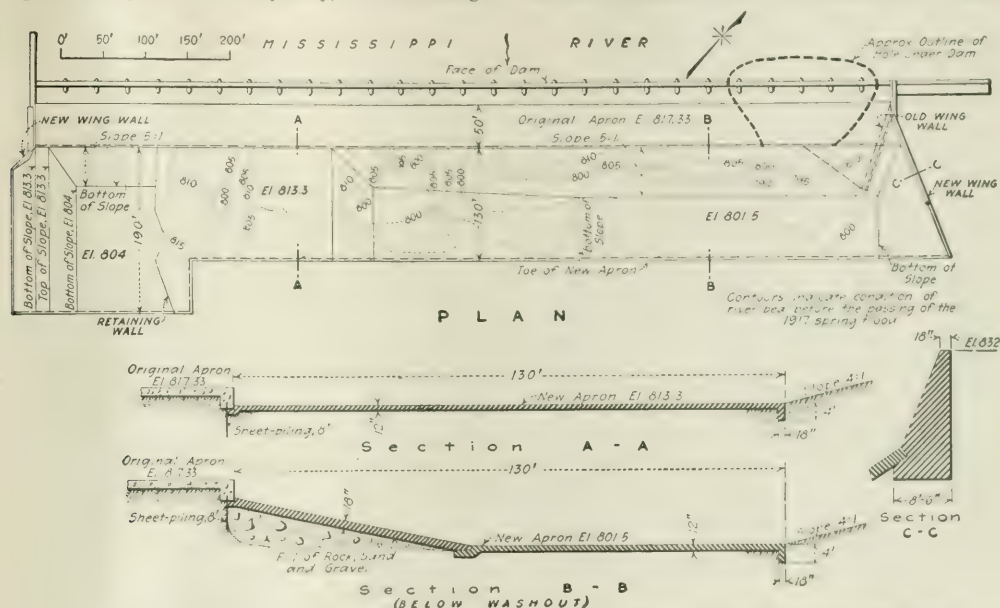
FIVE BAYS OF DAM UNDERMINED BY WASHOUT—NEW APRON BUILT OVER SCoured-OUT AREA
